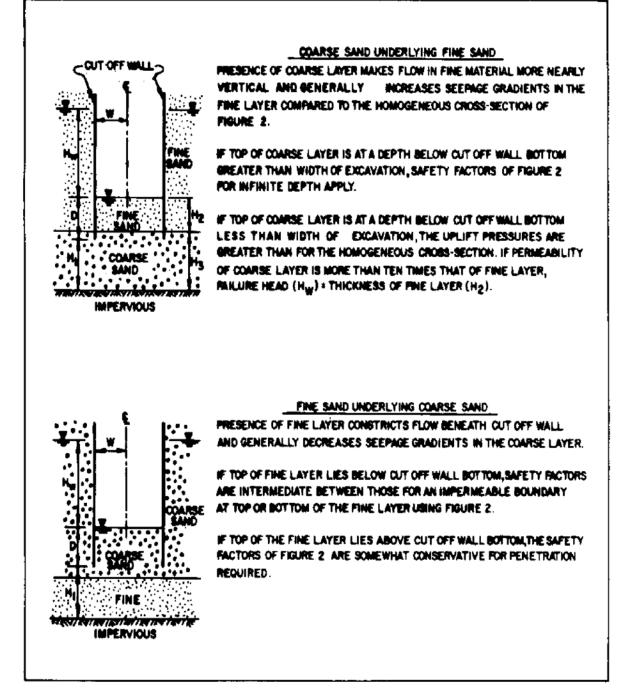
Penetration of Cut Off Wall Required to Prevent Piping in Stratified Sand
